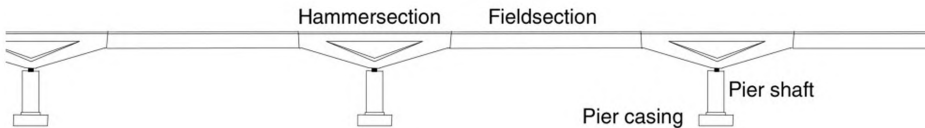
Bridge-sections are divided into hammer-sections and field-sections.
